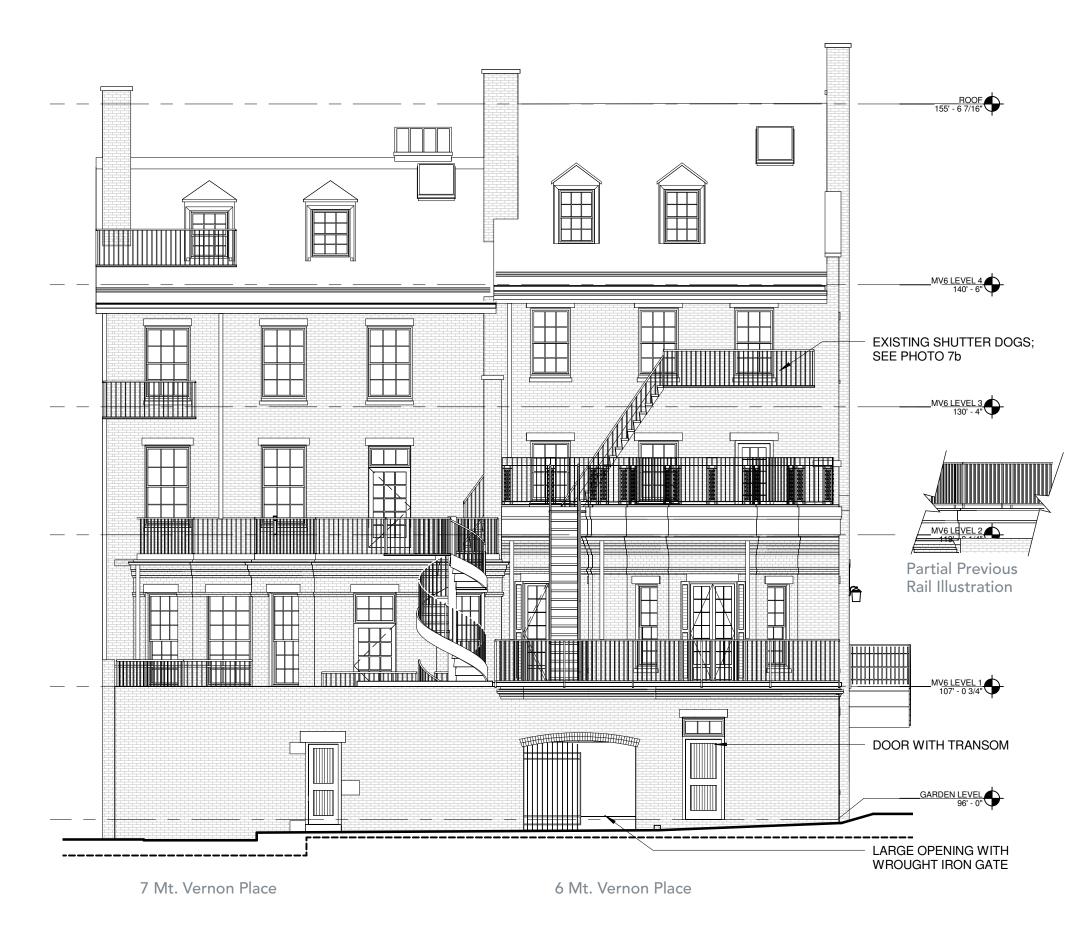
View of Joy Place from Joy Street Illustrating Elevations as Approved July 2014
